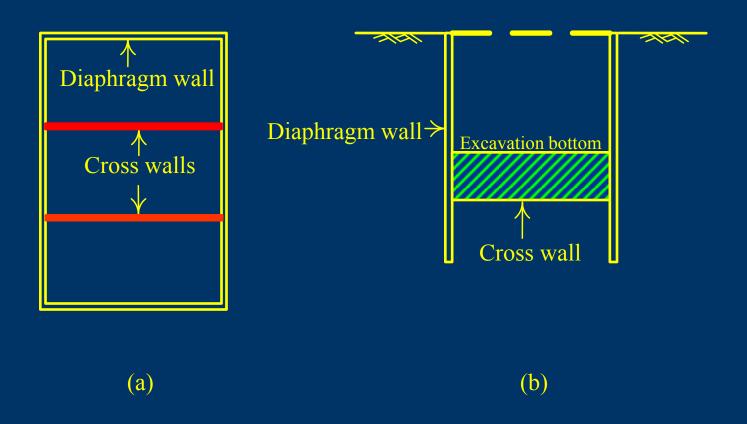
Configuration of cross walls (a) plan (b) profile
